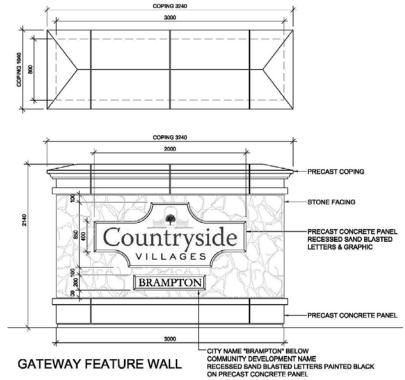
A Toolkit of Masonry Features for Area 48-2 - Tall Columns and Landscape Walls
